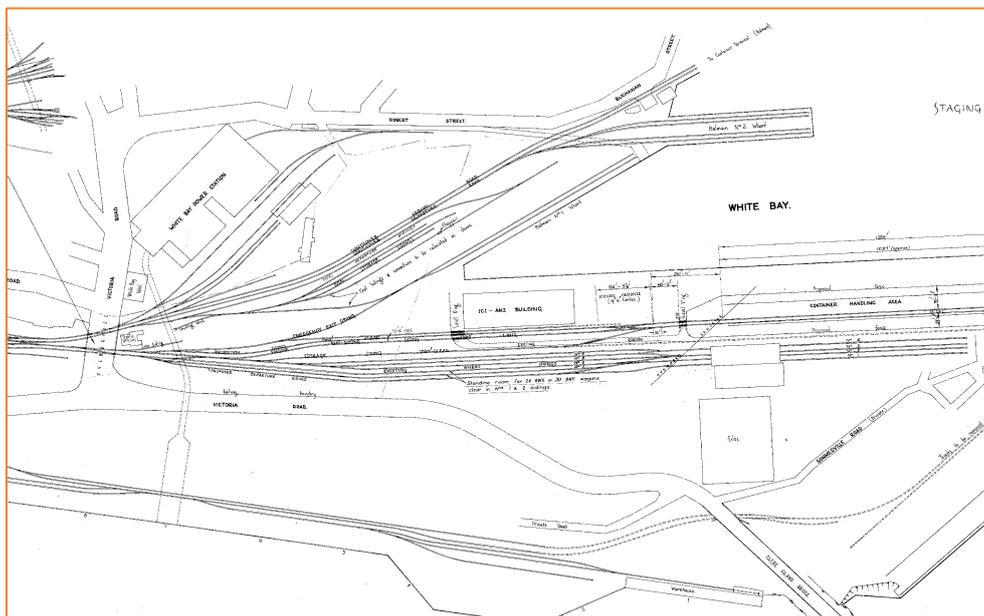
Plan approved in 1971, showing the new and relocated sidings for the new container handling areas on Glebe Island and at Balmain. Source: Transport for NSW Plan Room, ‘Department of Railways NSW, Remodelling of Yard and Proposed Container Sidings’, CV0050116
